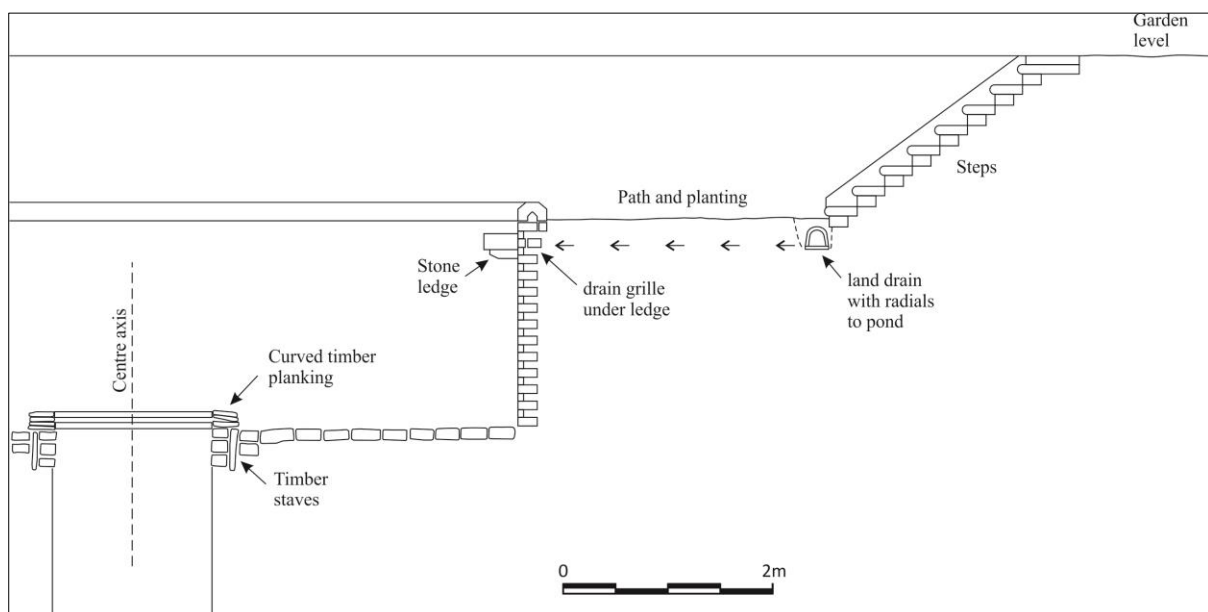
A scale cross-section of (one half of) the pond, central well and the northern flanking flight of steps.
